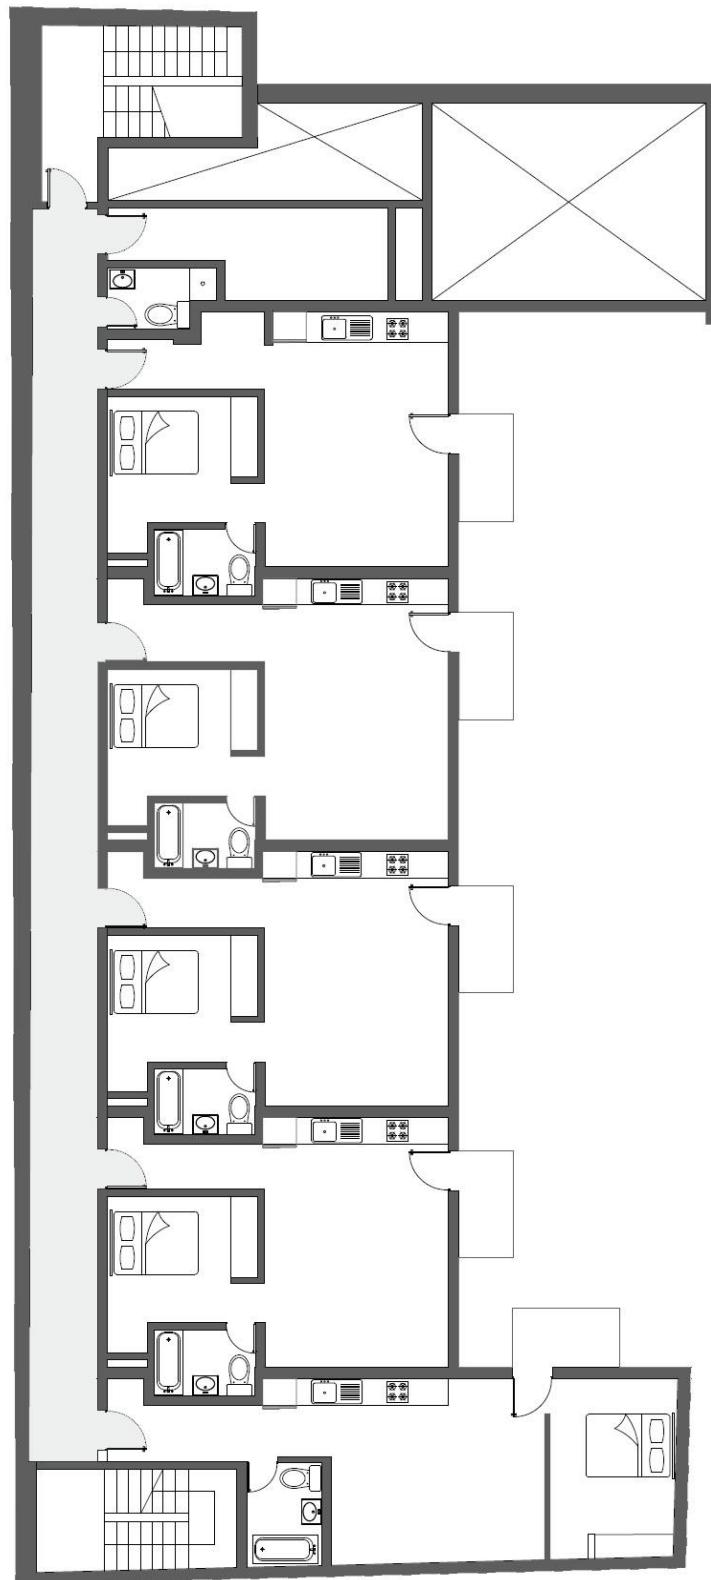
Second and third floors' layout – Les Jardins du Y des femmes. SCALE: 1:150
